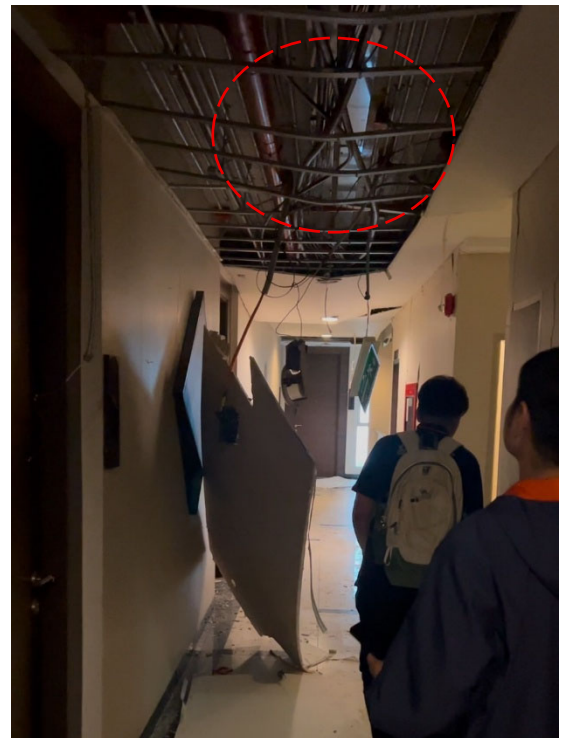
Ceiling Falls in Many Buildings in Bangkok
